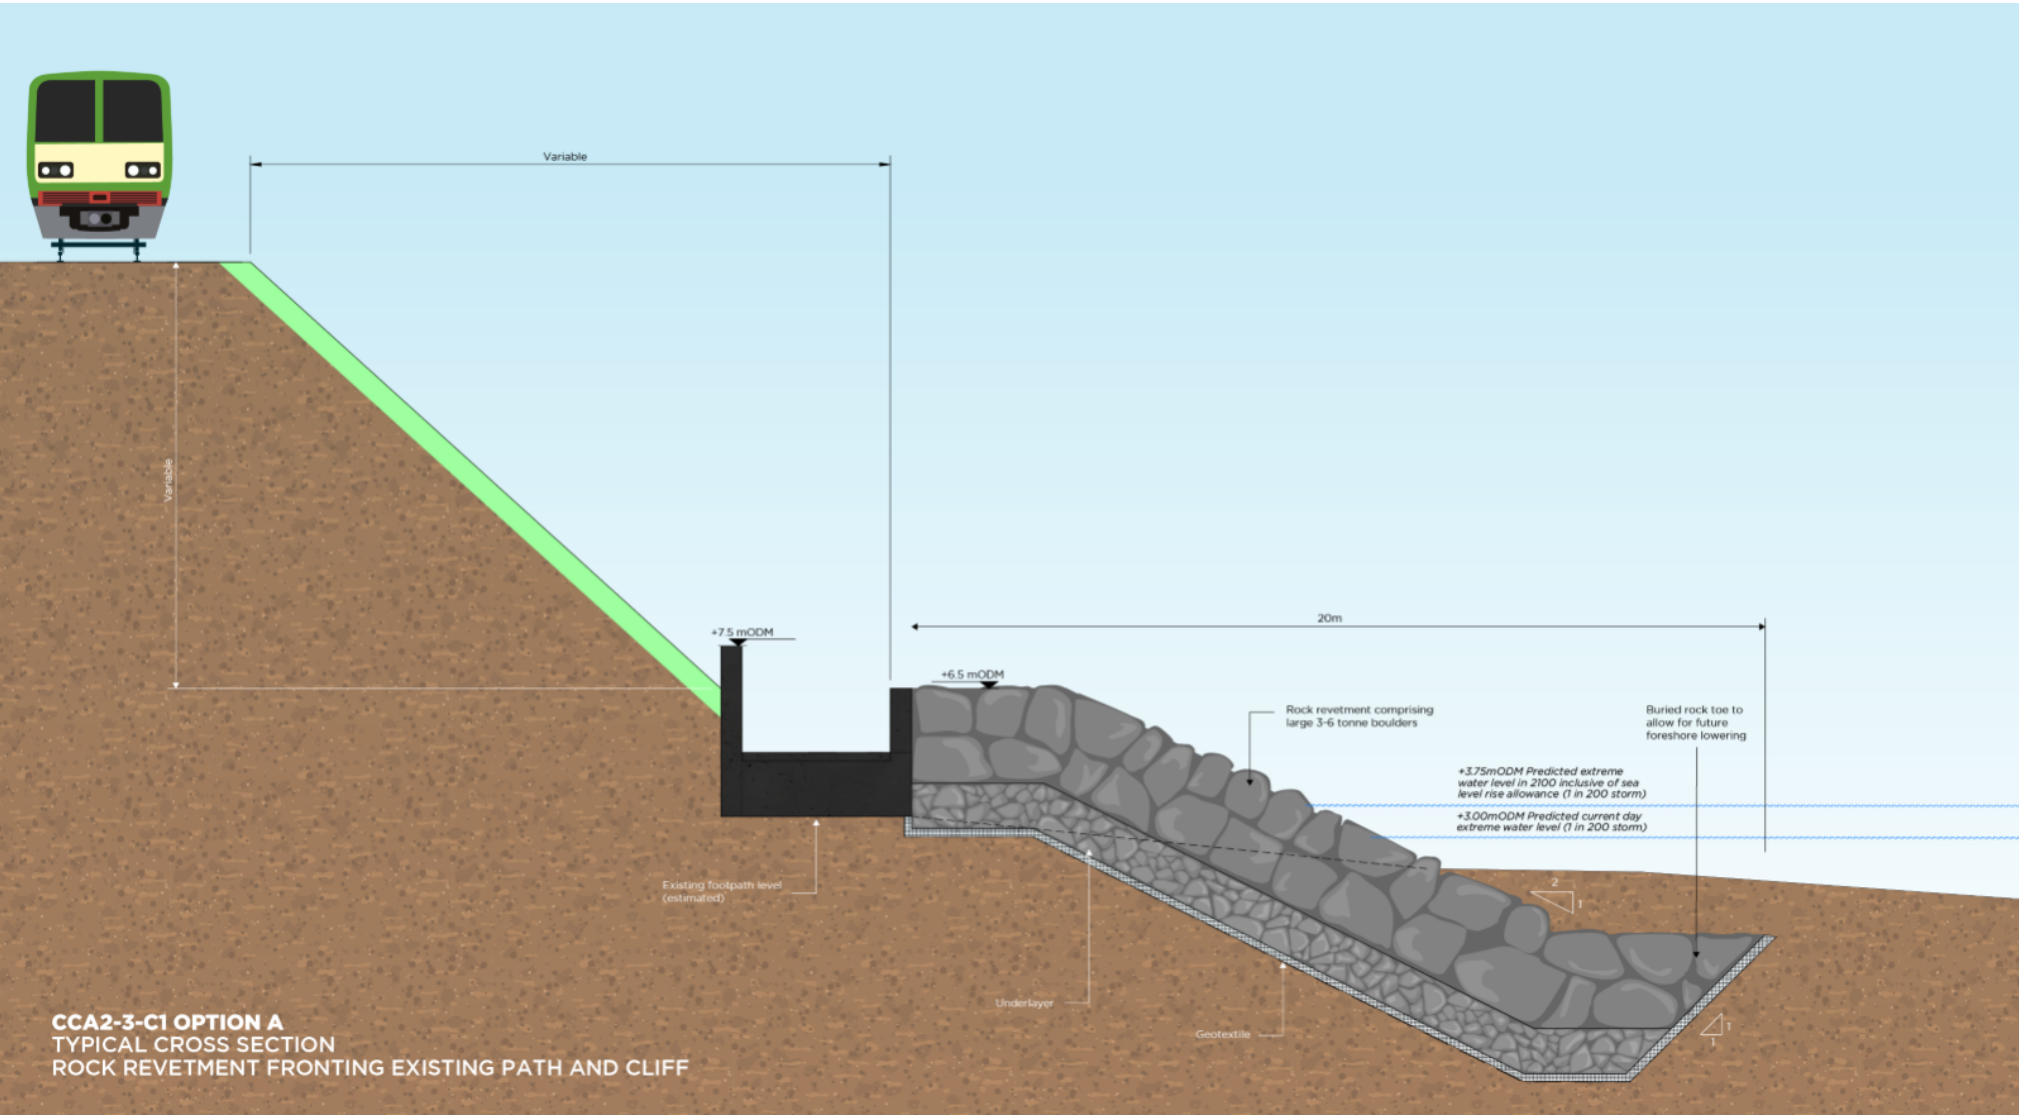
CCA2/3-C Option A Typical Cross Section
